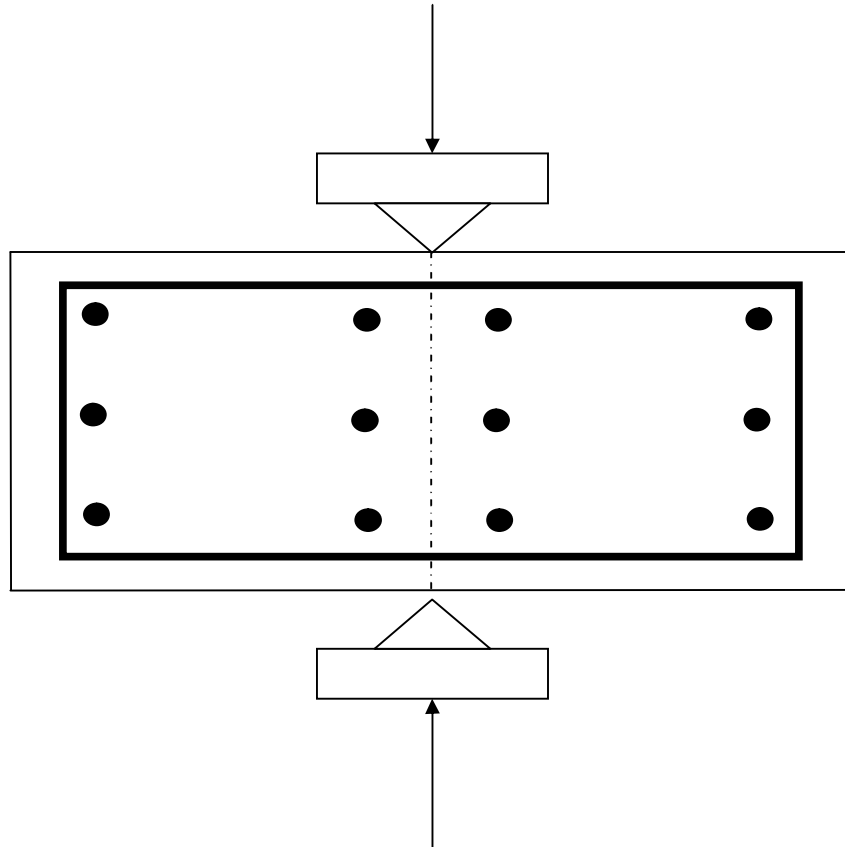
Section cut showing loading and position of monolithic specimen during pre-cracking.
